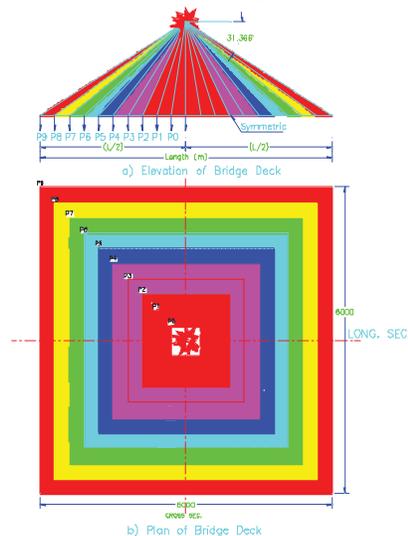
Plan and Elevation of Blast pressure of distribution on Bridge Deck
